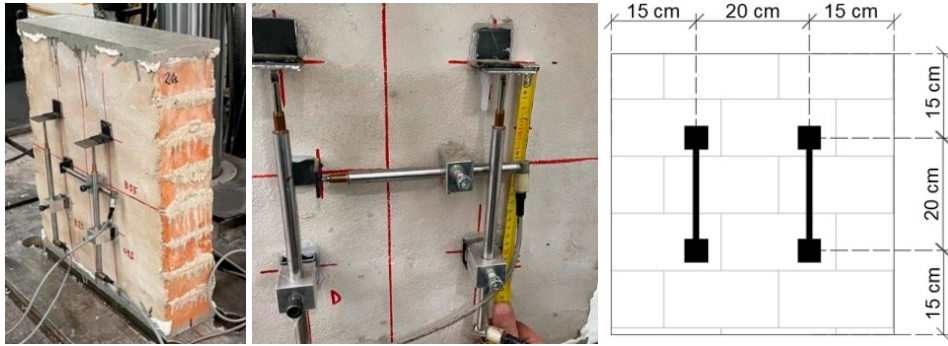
Compressive test on the unreinforced masonry wall and position of the transducers.
